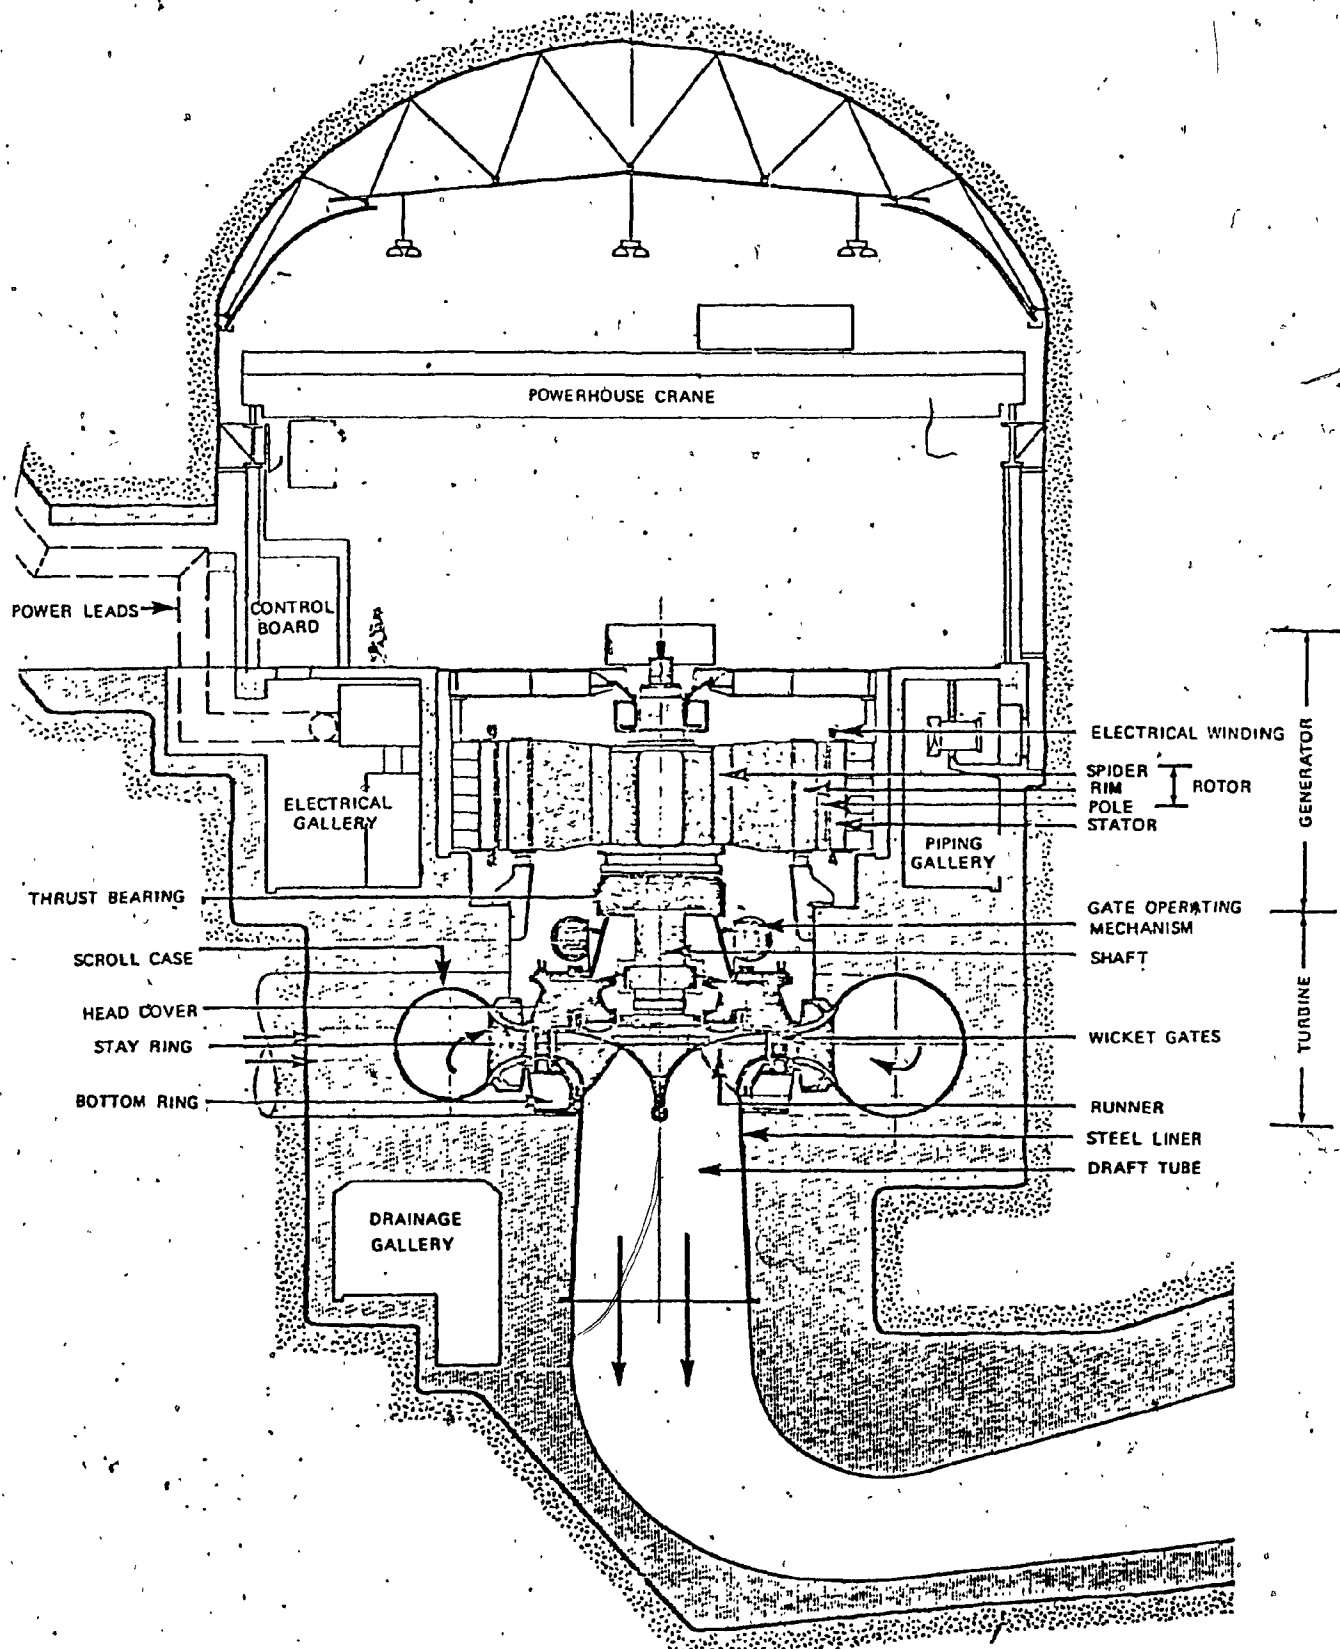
TYPICAL CROSS-SECTION OF AN UNDERGROUND POWERHOUSE
